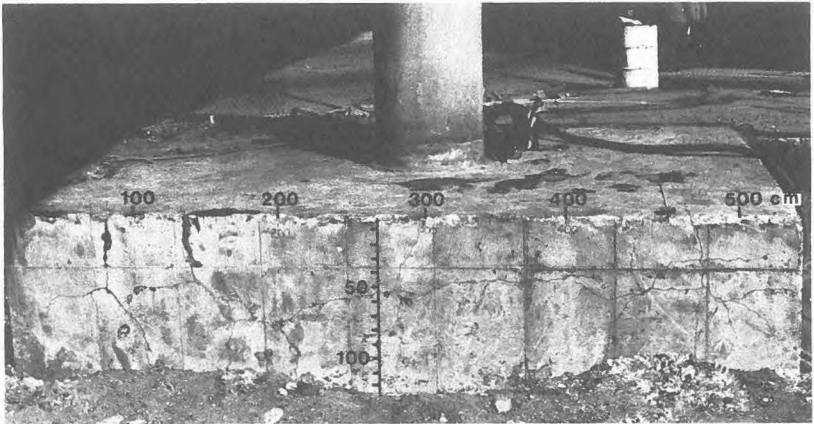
Typical AAR Cracking to the Side Face of a Column Pile Cap
